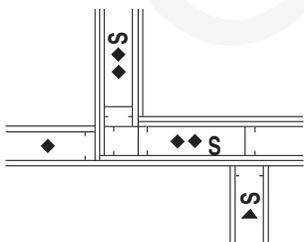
(b) Symbol Used to Note Wall Ratings on Design and Construction Documents.
